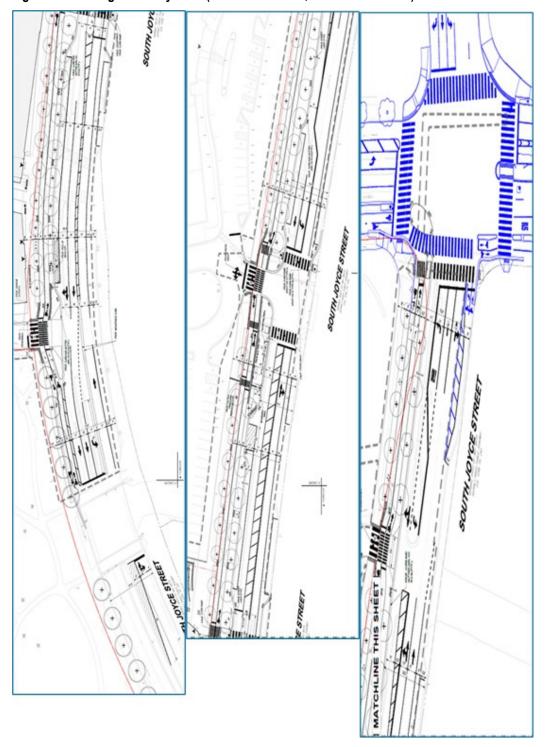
Redesigned S. Joyce St. (from N1 Site Plan, Sheets 500N-504N)
